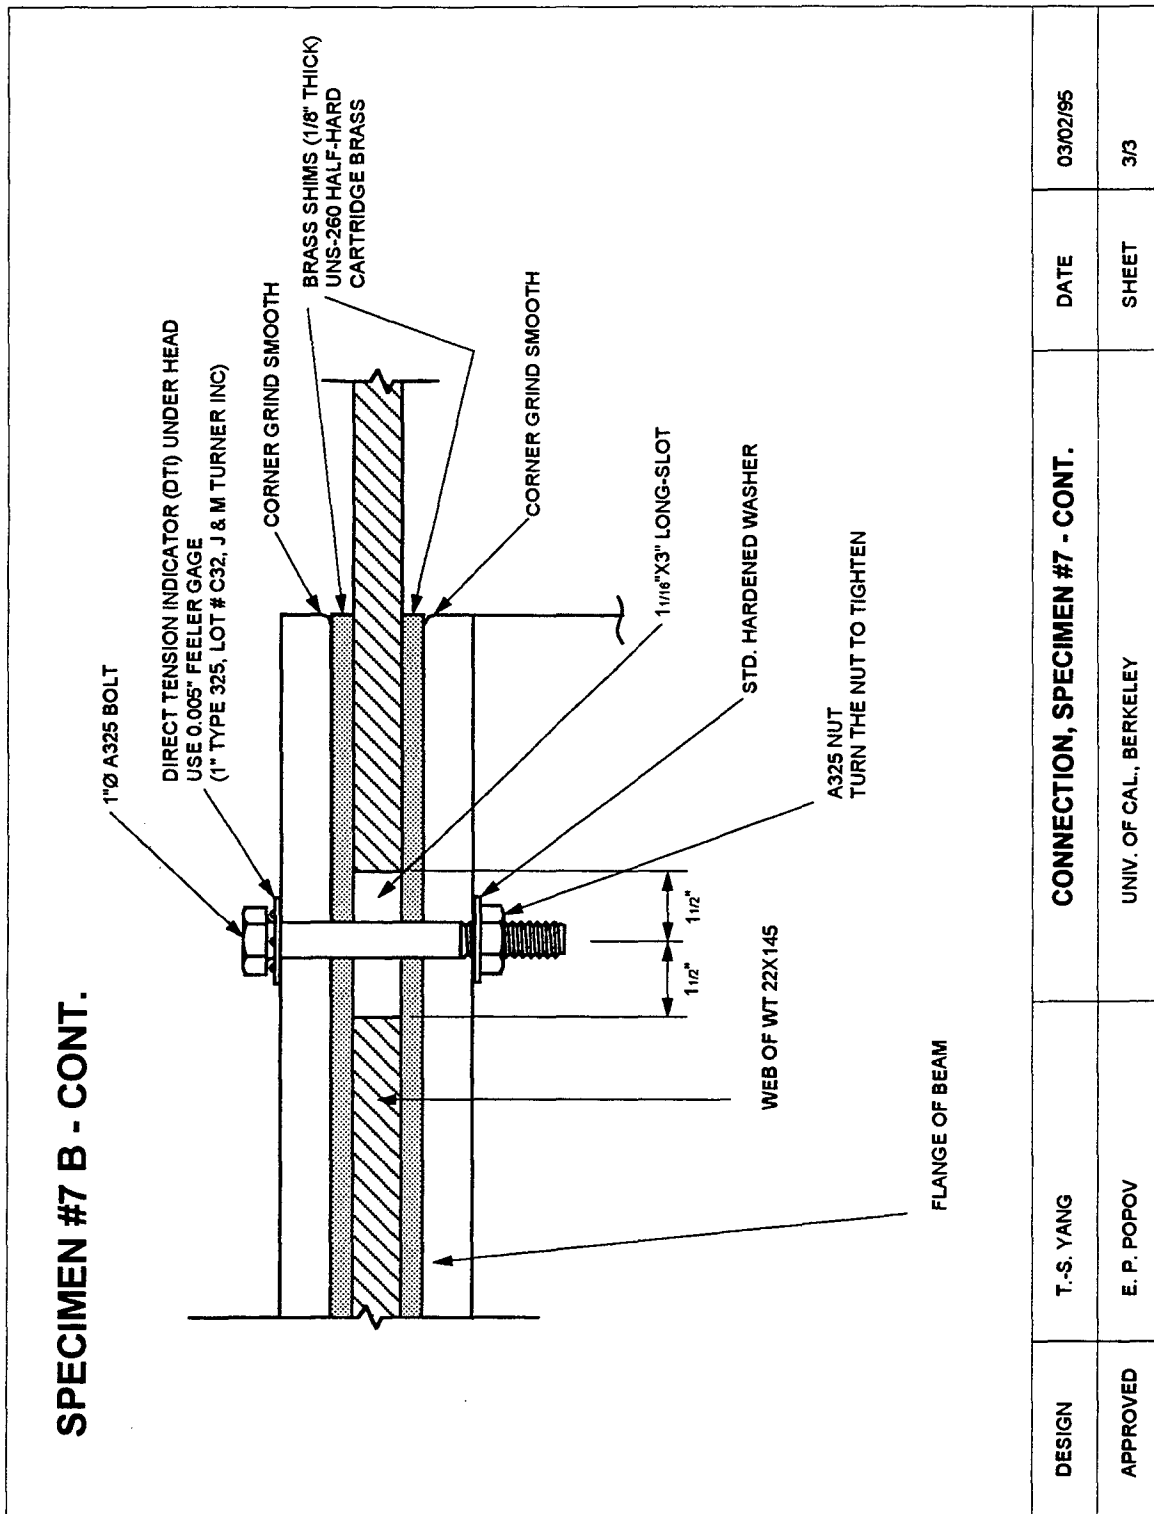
Detail of a rotational friction damper: Specimen 7B (Sheet 3/3).
